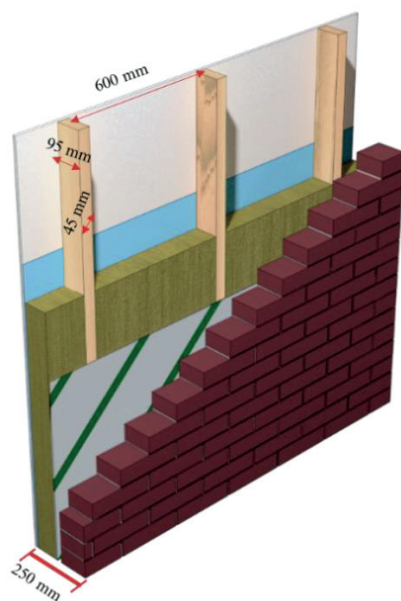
A typical schematic of a timber frame wall with brick veneer built in Sweden (thickness of  $\sim 250 \text{ mm}$ ) modelled in this study. Different layers of the wall assembly and their corresponding dimension from right side (exterior): brick masonry veneer (120 mm), air gap (20 mm), asphalt impregnated paper (1 mm), mineral wool insulation (95 mm), timber studs (95 mm  $\times$  45 mm) with center to center distance of 600 mm, vapor retarder (1 mm), and gypsum board (12.5 mm).
